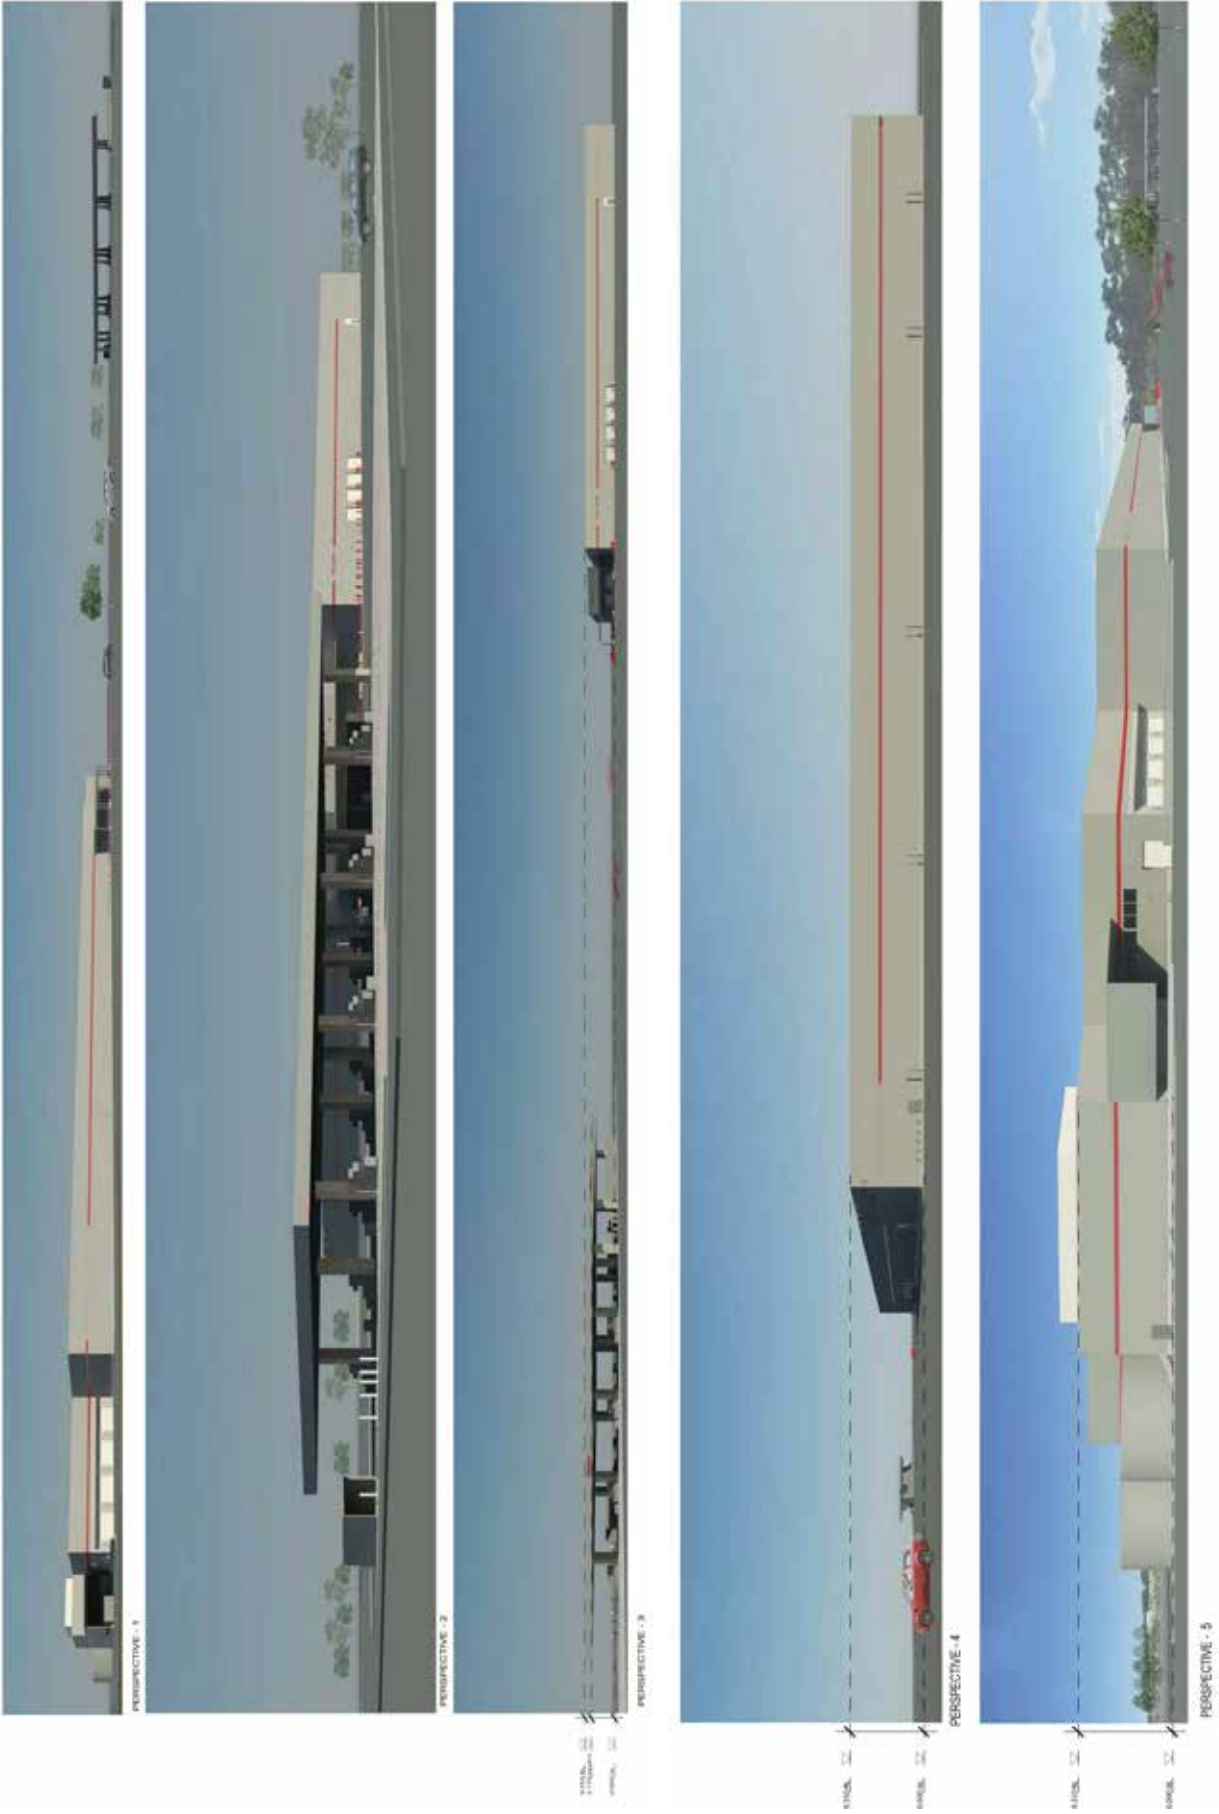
Artistic impressions of the proposed development (East, North and North West) Site elevation
